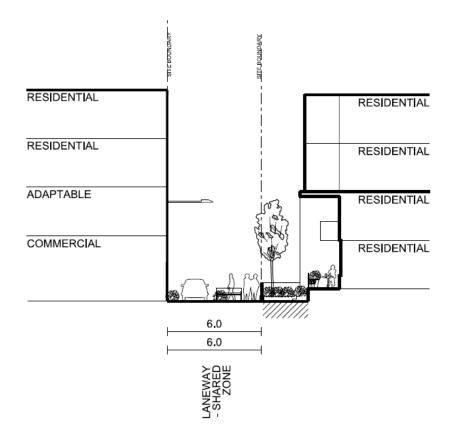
Section G – Laneway - Shared Zone Typical Section – 6m (Hatter Lane)
